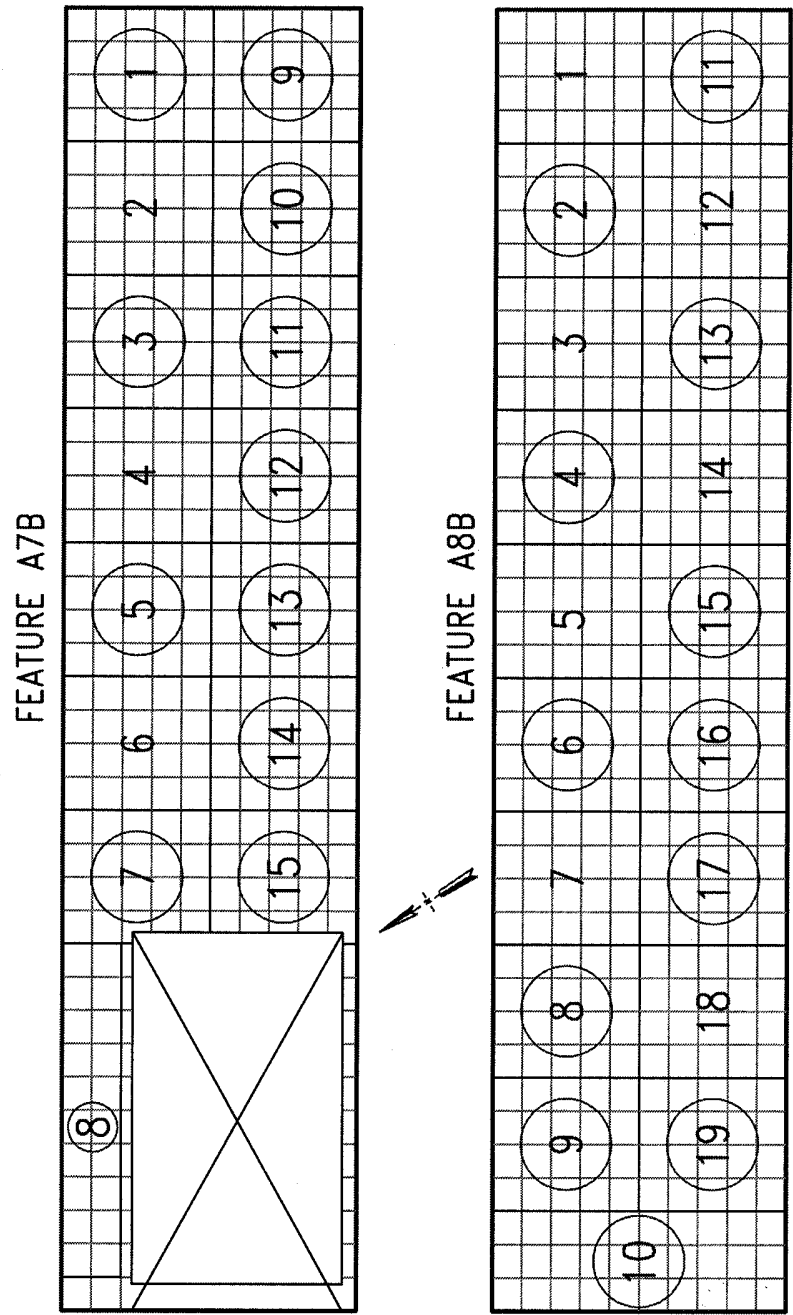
Sample unit layout, Delta Parking Ramp, features A7B and A8B
